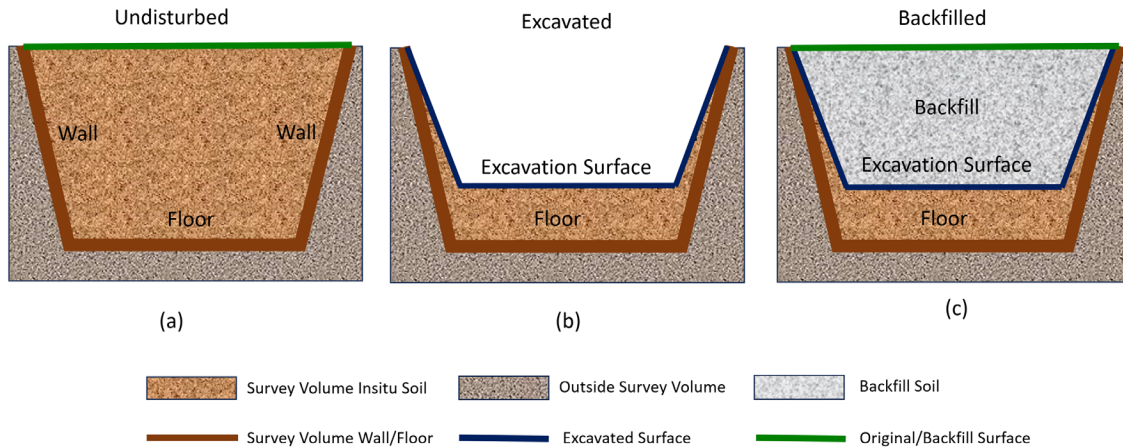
Example configurations for excavated subsurface survey units. (a) Undisturbed soils the license may wish to leave behind, (b) an excavation that will remain open, and (c) an excavation that will receive backfill.
